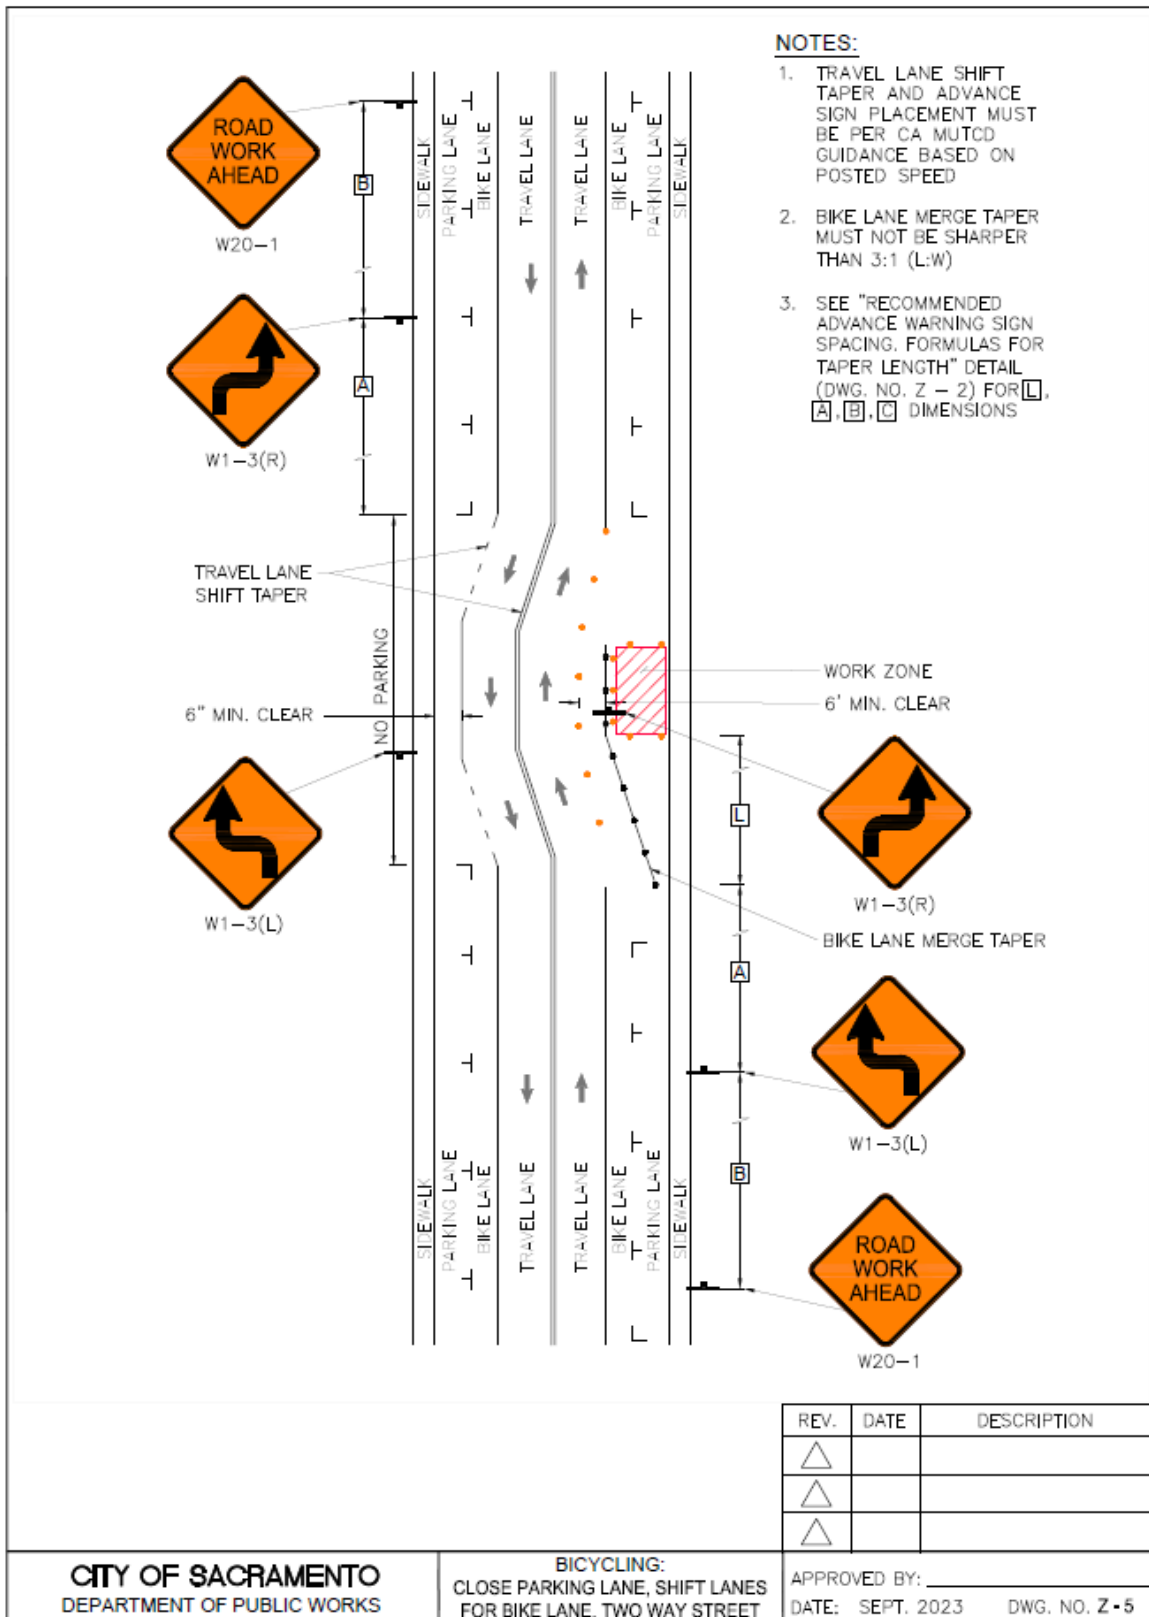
Bicycling: Close Parking Lane, Shift Lanes for Bike Lane, Two Way Street
